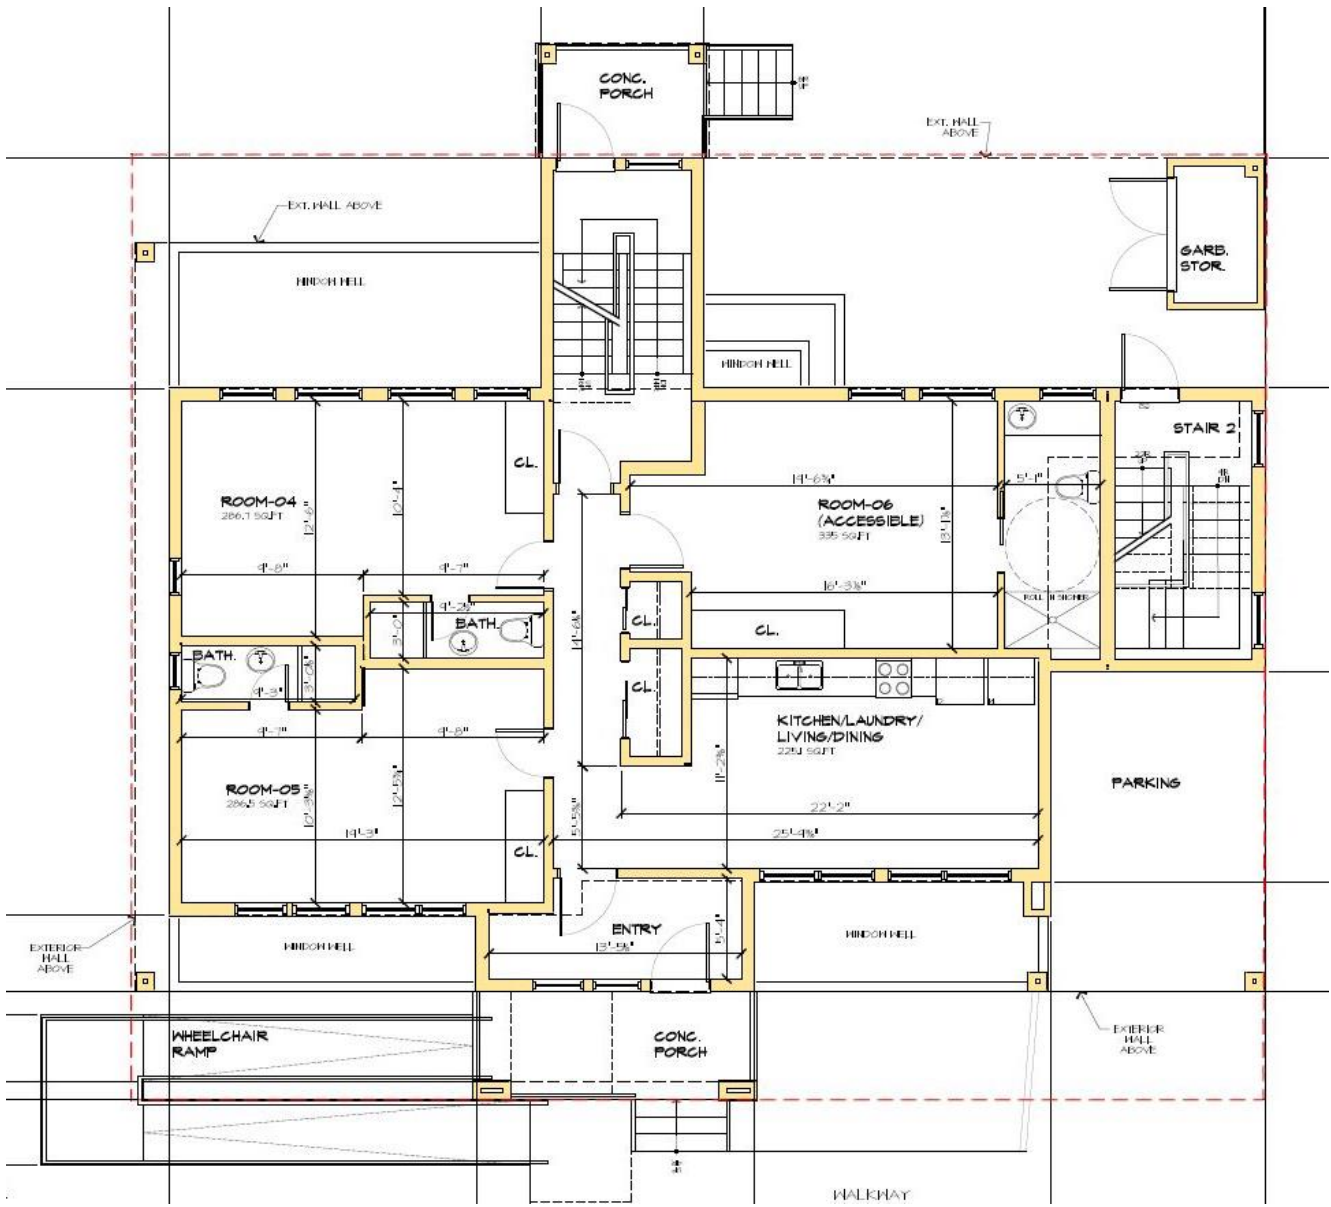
Main floor plan (Source: Hamel Design and Planning)
